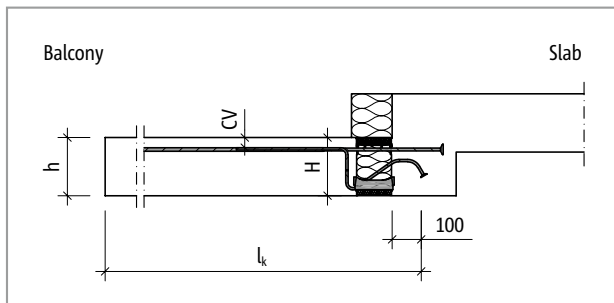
Schöck Isokorb® XT type K-U: Static system
